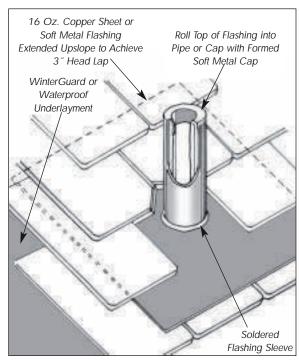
Pipe Penetration Flashing for Shingle Tile
